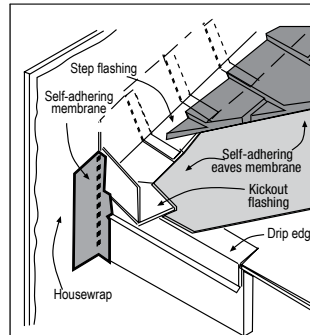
, Kickout Flashing * To prevent water from dumping behind the siding and the end of the roof intersection, install a "kickout" of sufficient length and angle to direct the water running down the roof away from the siding.
